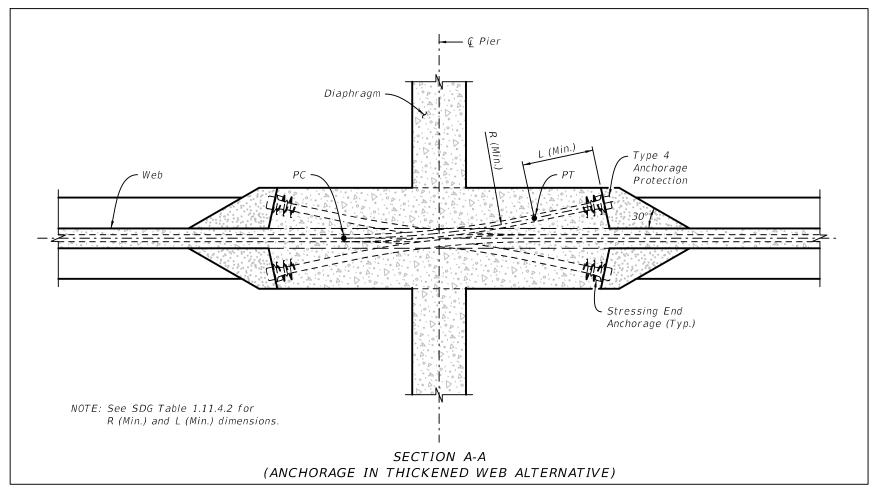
Post-Tensioned Spliced Girder Details - Tendons Internal to the Web (3 of 4)
